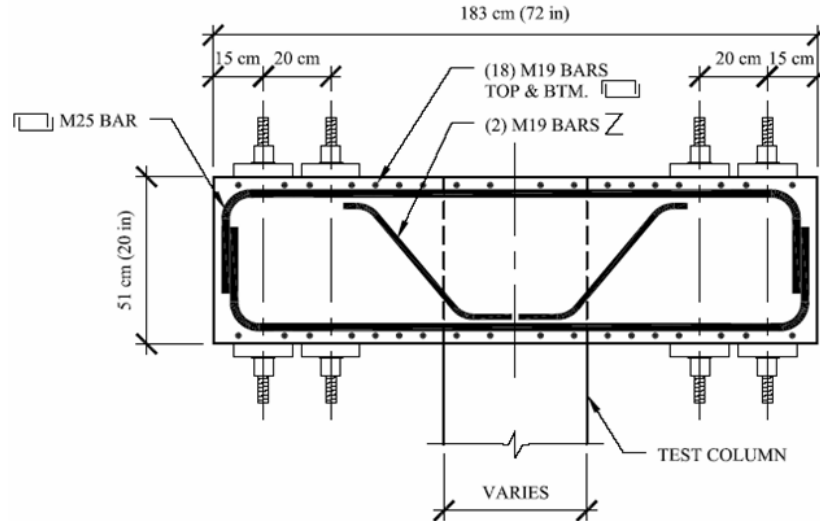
Schematic of Longitudinal Section of Shear Column Load Stub
